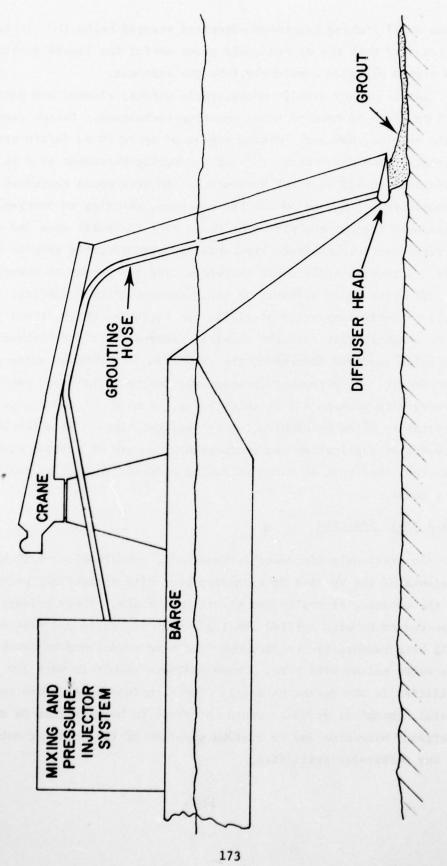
POSSIBLE GROUTING ARRANGEMENT.
